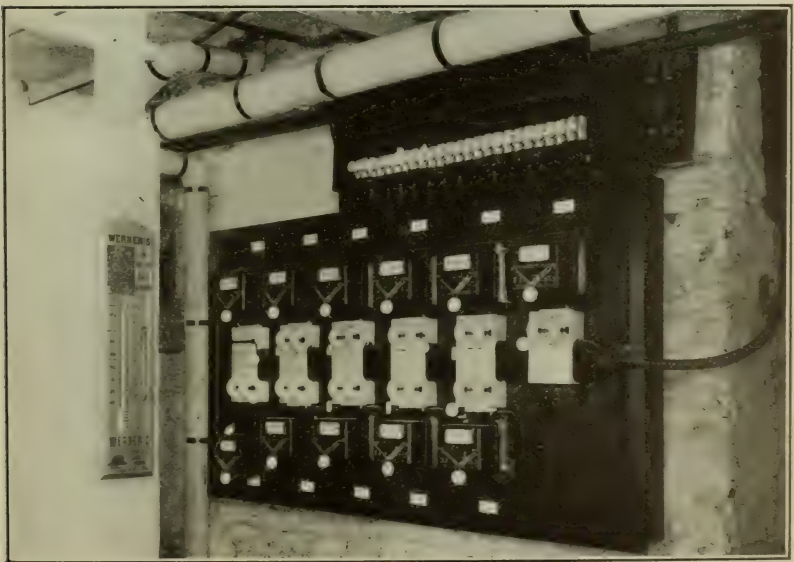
Group of General Electric Type 'I' and Westinghouse type 'C E' Induction Watthour Meters equipped with Metropolitan Protective Devices showing application of cutouts, wiring frames and sealing devices.
